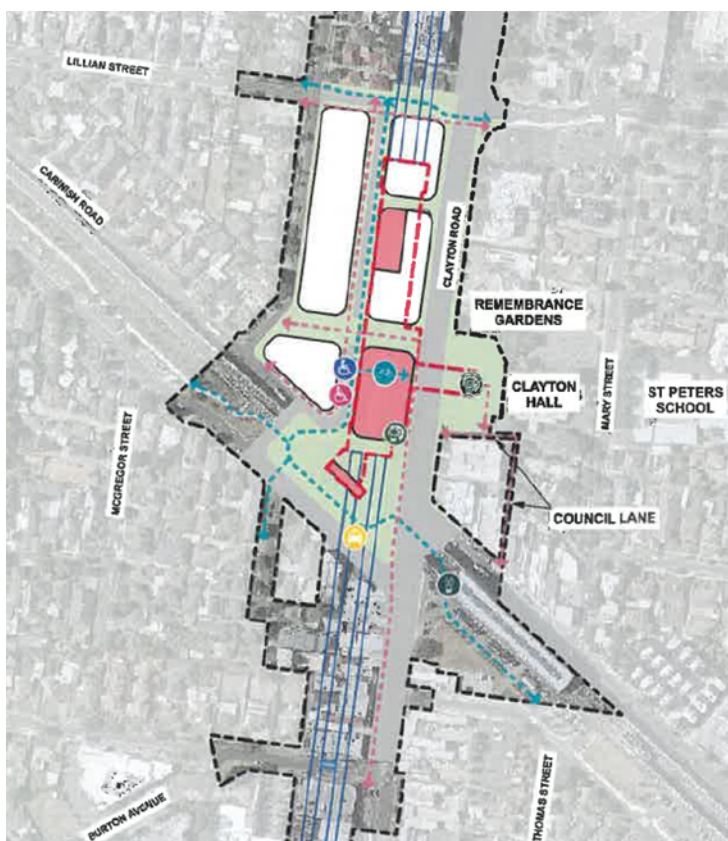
Updated Surface and Tunnel Plan for Clayton SRL Station
